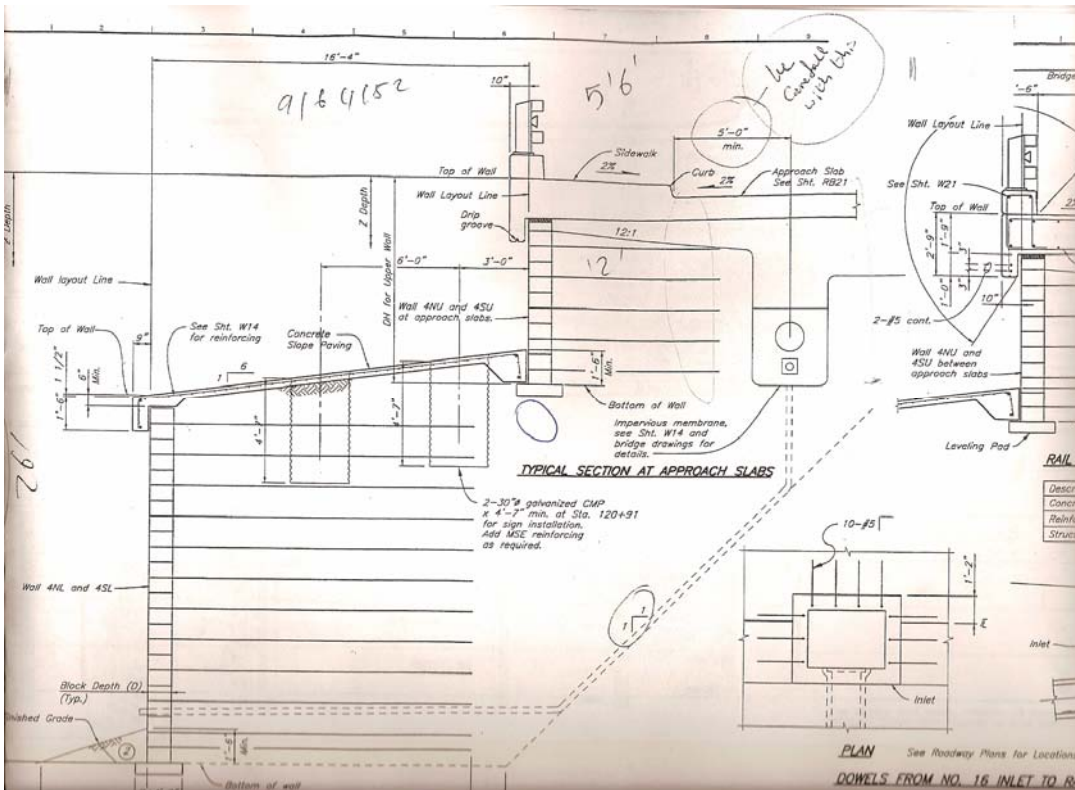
A Section along the Upper and Lower MSE Walls of the Salt Creek Bridge.
